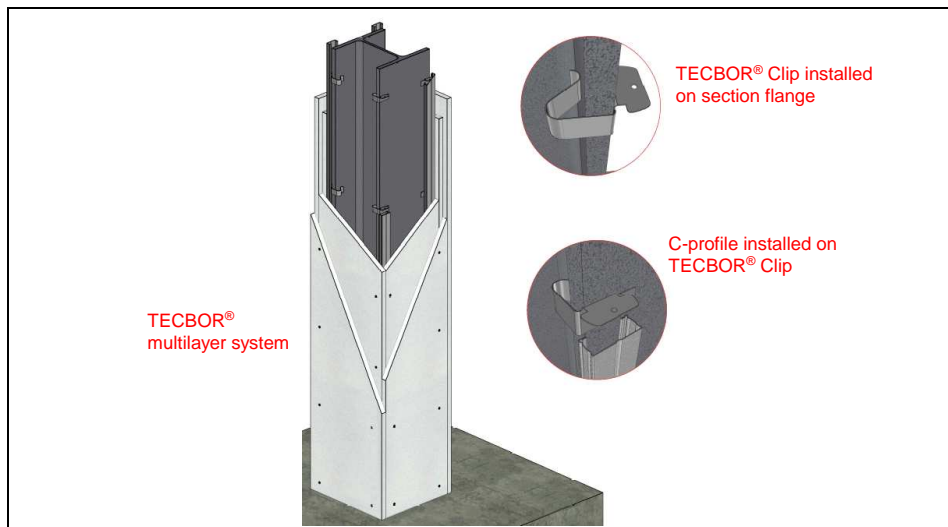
Installation TECBOR® Clips, C-profiles and TECBOR® boards.
